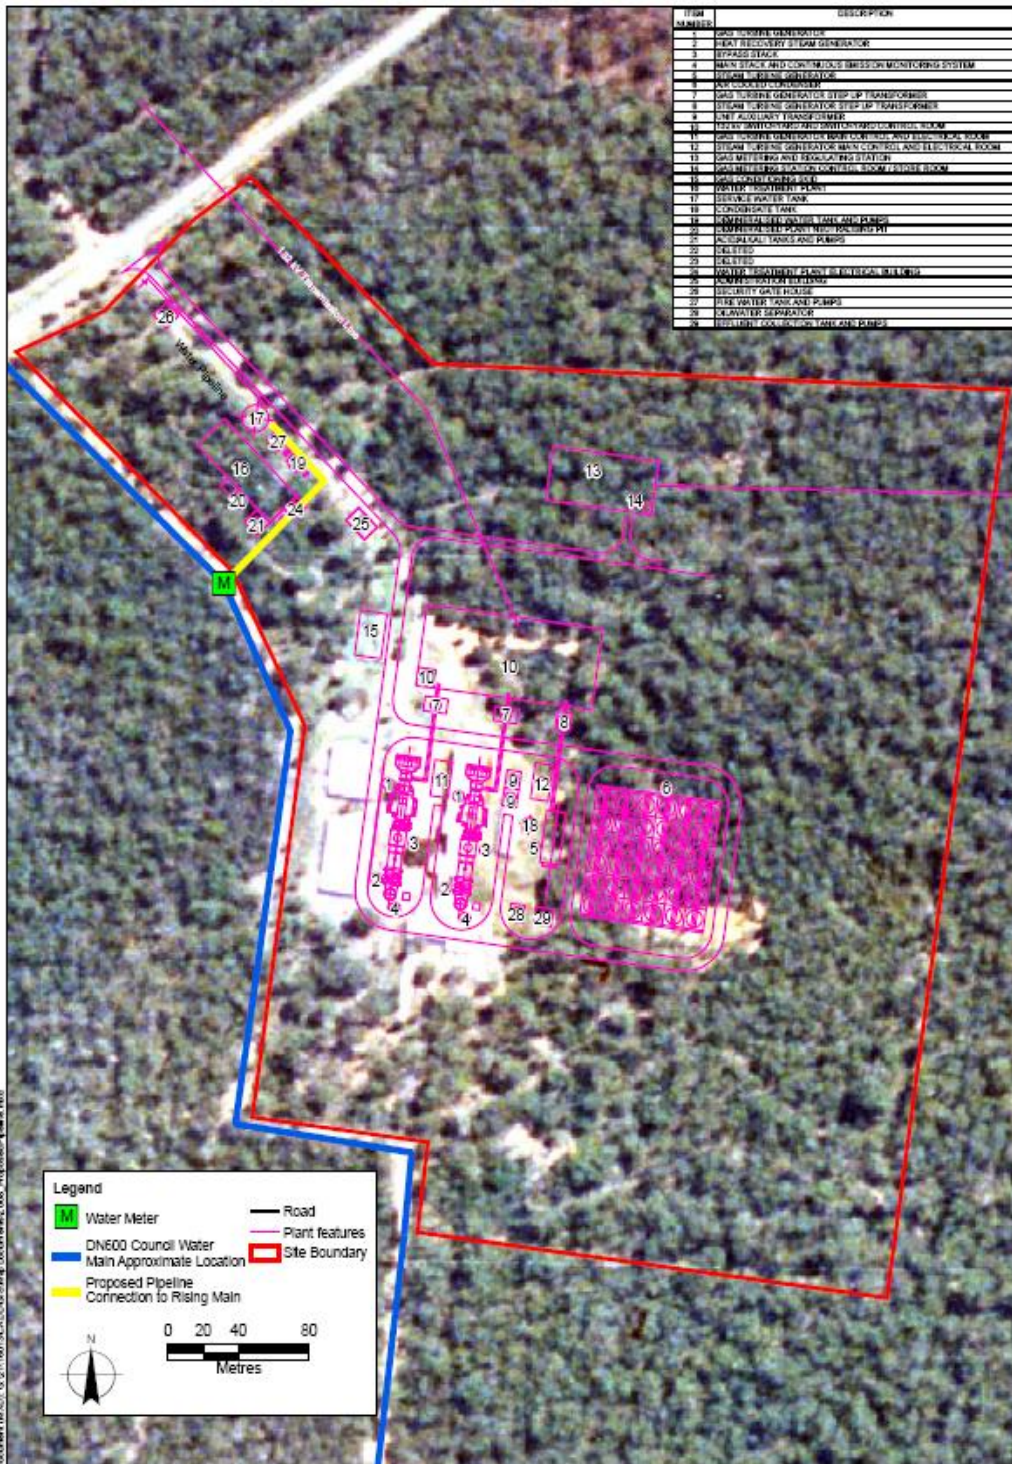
Proposed Pipeline and Connection to DN600 Hobas Rising Main
